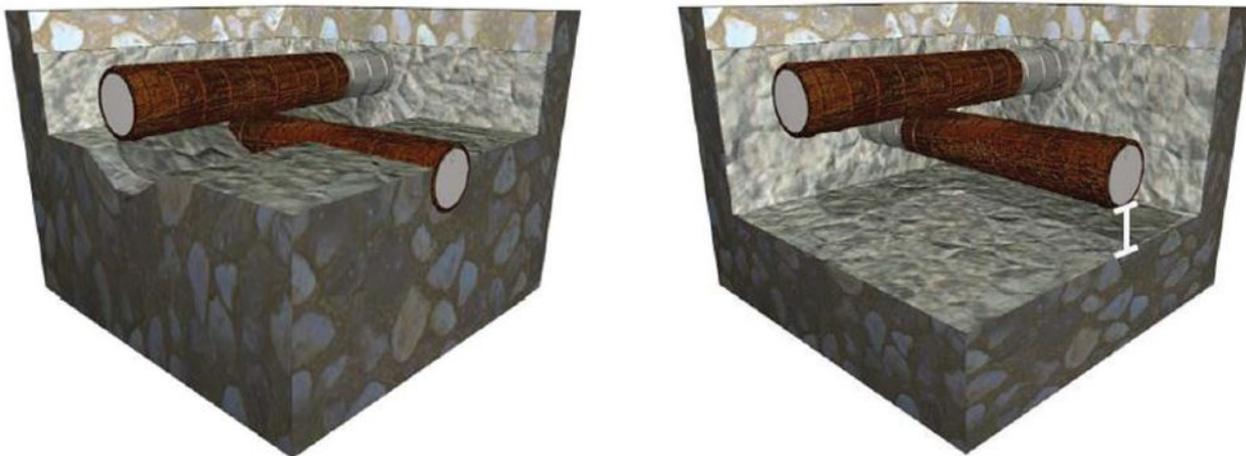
When multiple reinforcing bars are corroded, concrete must be removed around the bar and where the bar has lost bond with the existing concrete, as shown in the right image. This ensures future protection of the bar. Figure: Structural Technologies.
